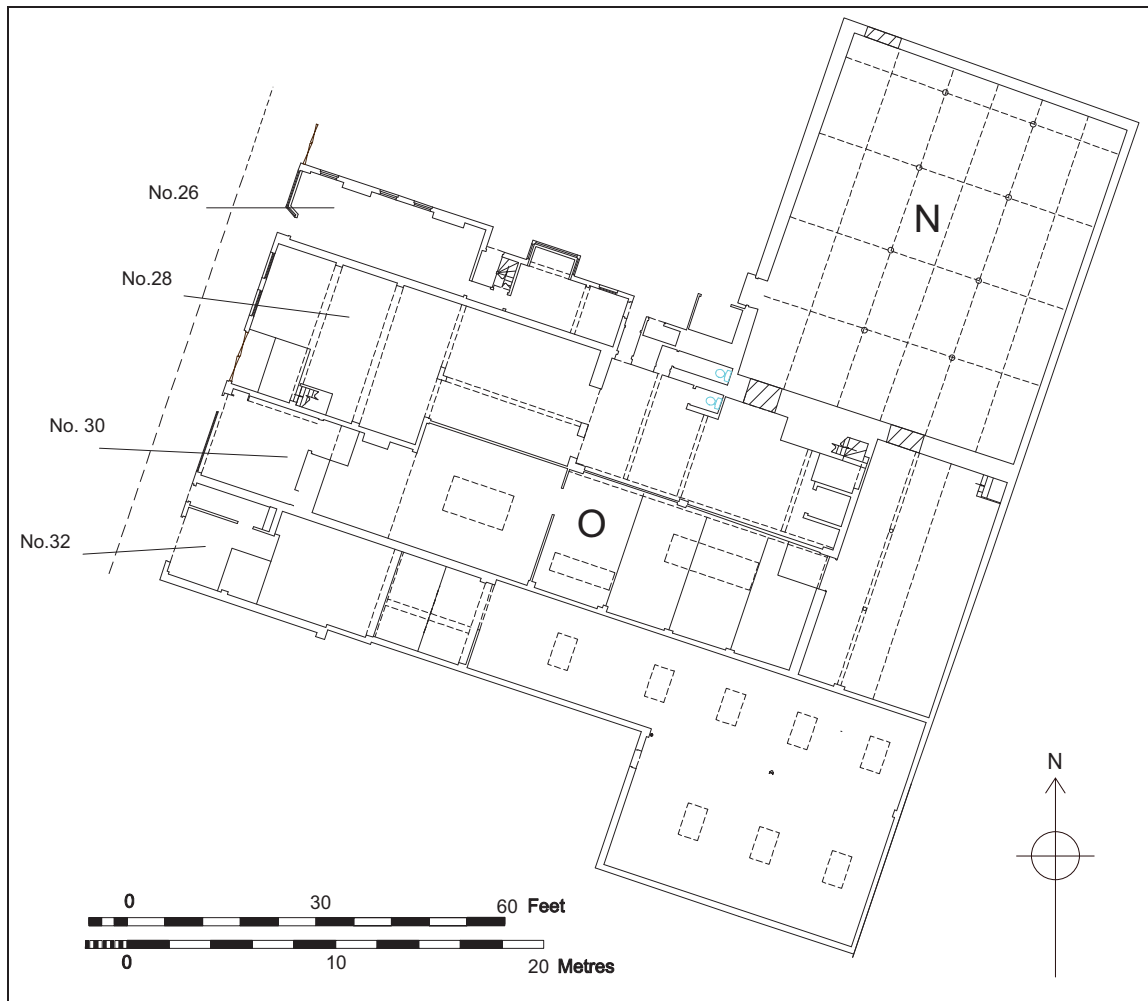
Blocks N and O, 26 -32 Canal Street, Ground Floor Plan
